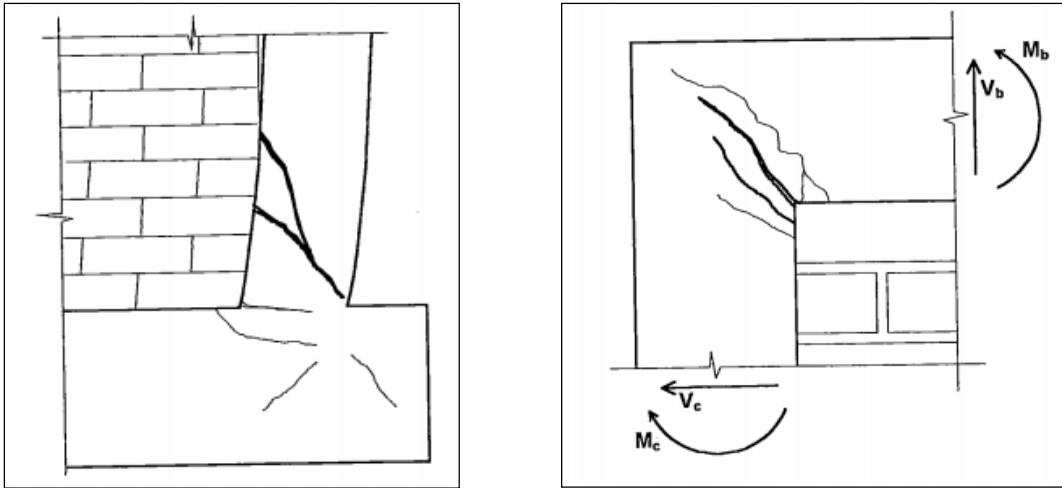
(a) Shear failure of the column. (Crisafulli, 1997); (b) Beam-Column joint failure. (Crisafulli, 1997)
